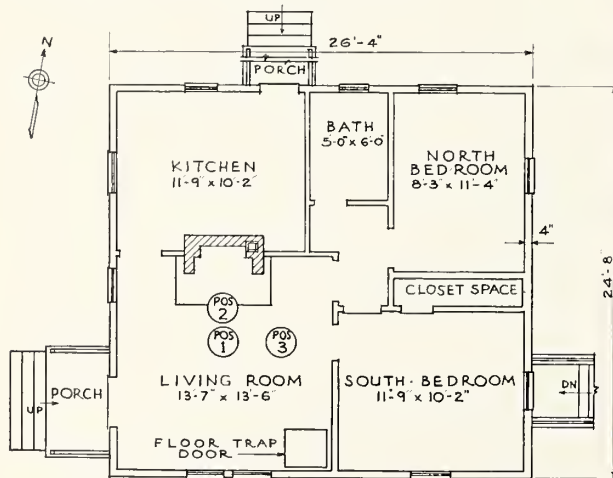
Floor plan of the Test Bungalow showing heater positions 1, 2, and 3 and alternate door to south bedroom open.
